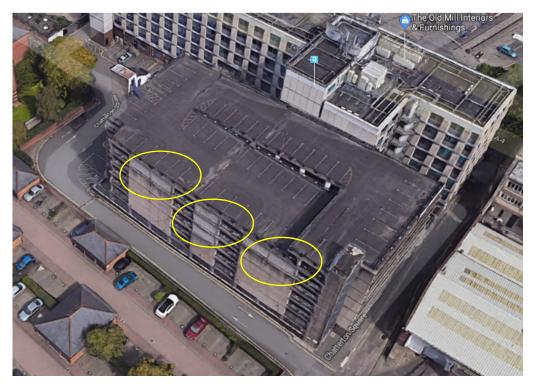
Infill wallsSouthwest Elevation Infill Walls (Missing Outer Leafs Ringed)
